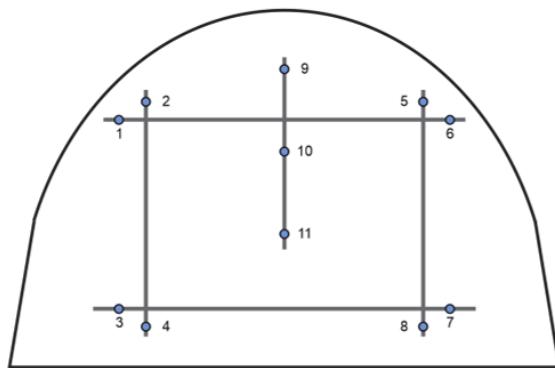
System of Pitot Tubes in the cross-section of mine excavation
